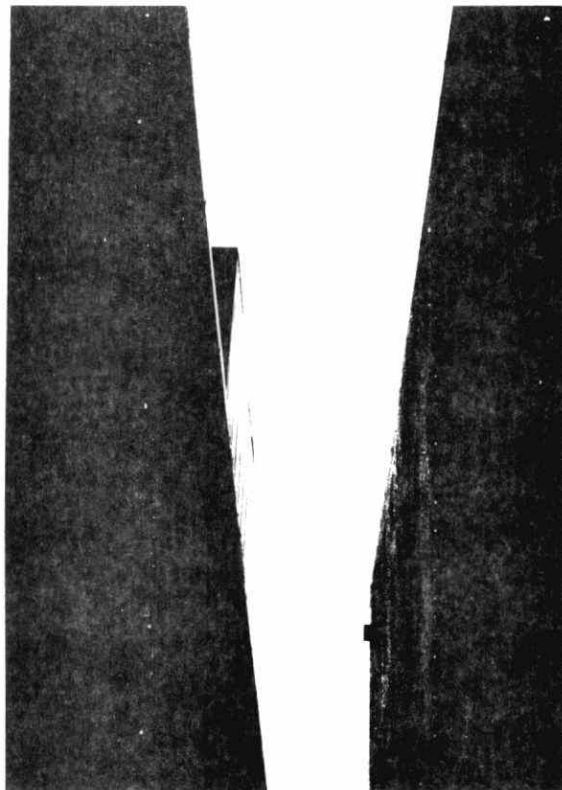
View of Spacing Between Kovac's Building and Adjacent Highrise Apartment Building.
